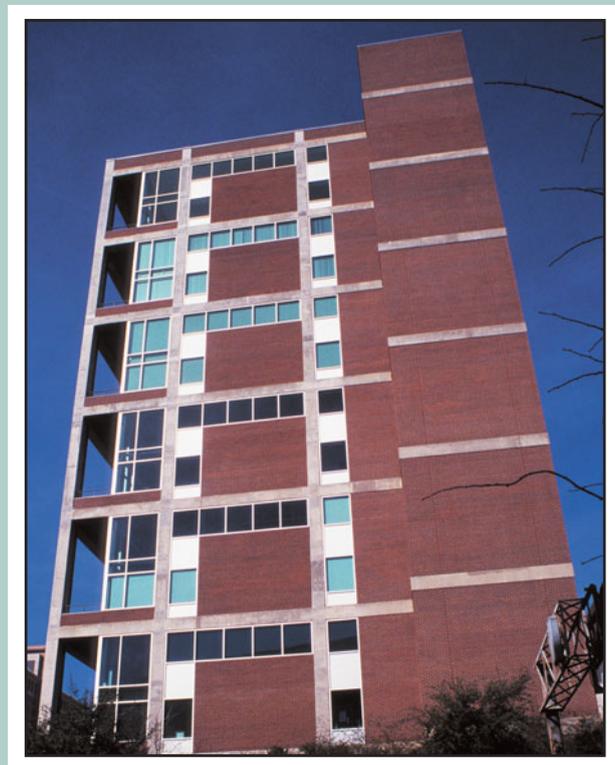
A typical example of an exposed structural frame and exterior infill walls.
